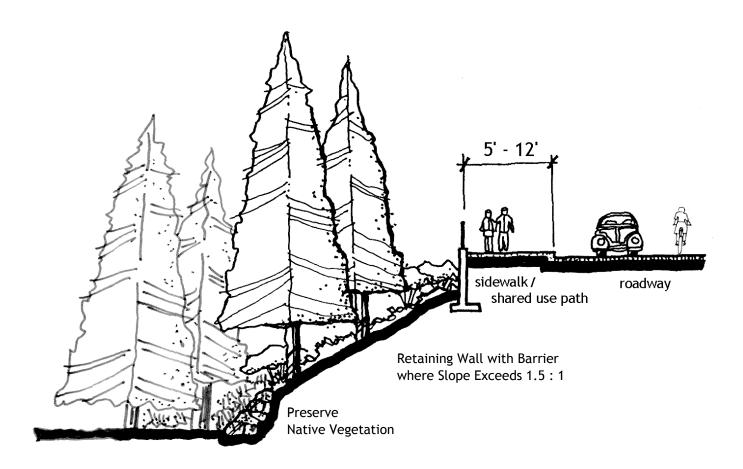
Local Access Trail/Pathway with a Curb-Separated Sidewalk or Shared Use Path
